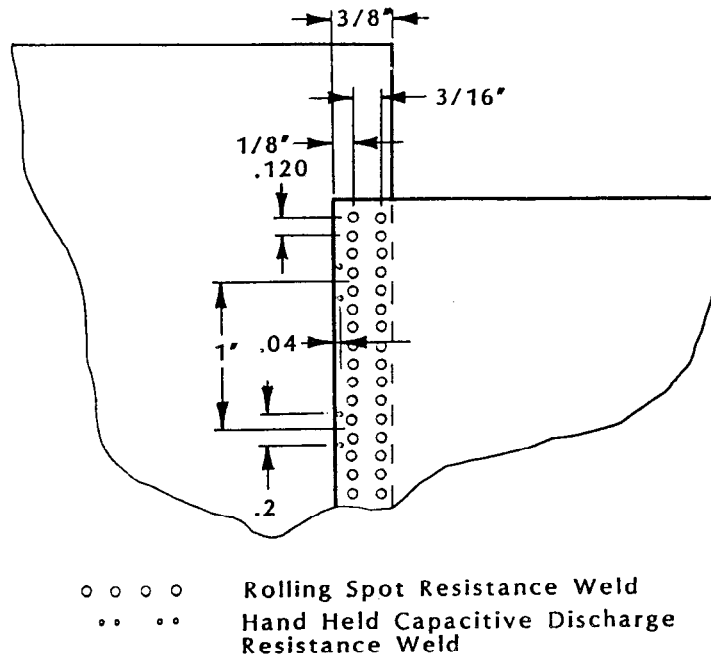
Metal Membrane Welded Seam Detail.
